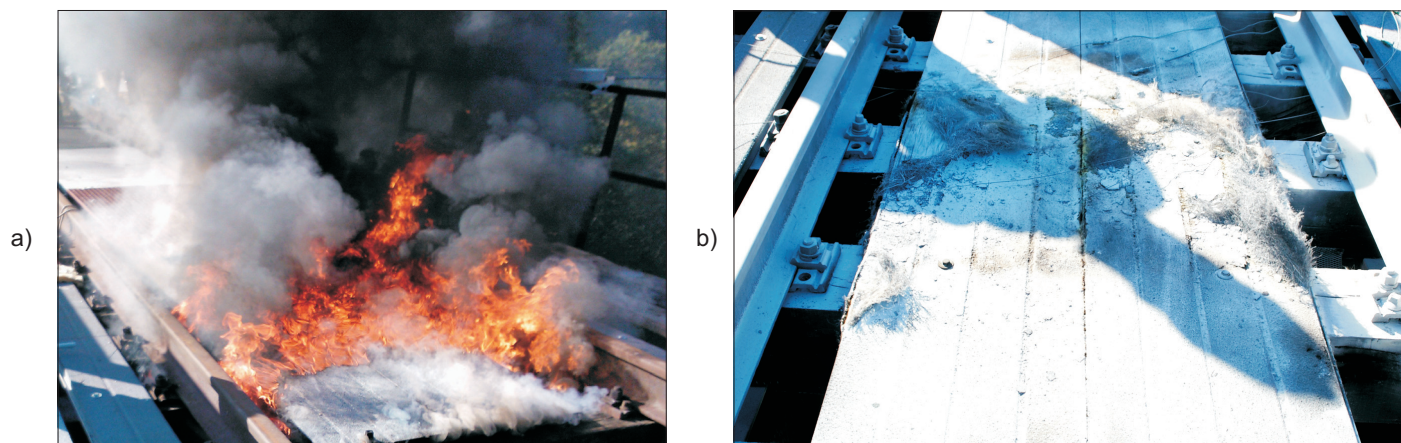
a) FRP floor deck PA40 ignited by burning papers placed between two sleepers, b) Destruction of floor deck PA40 after the fire test
